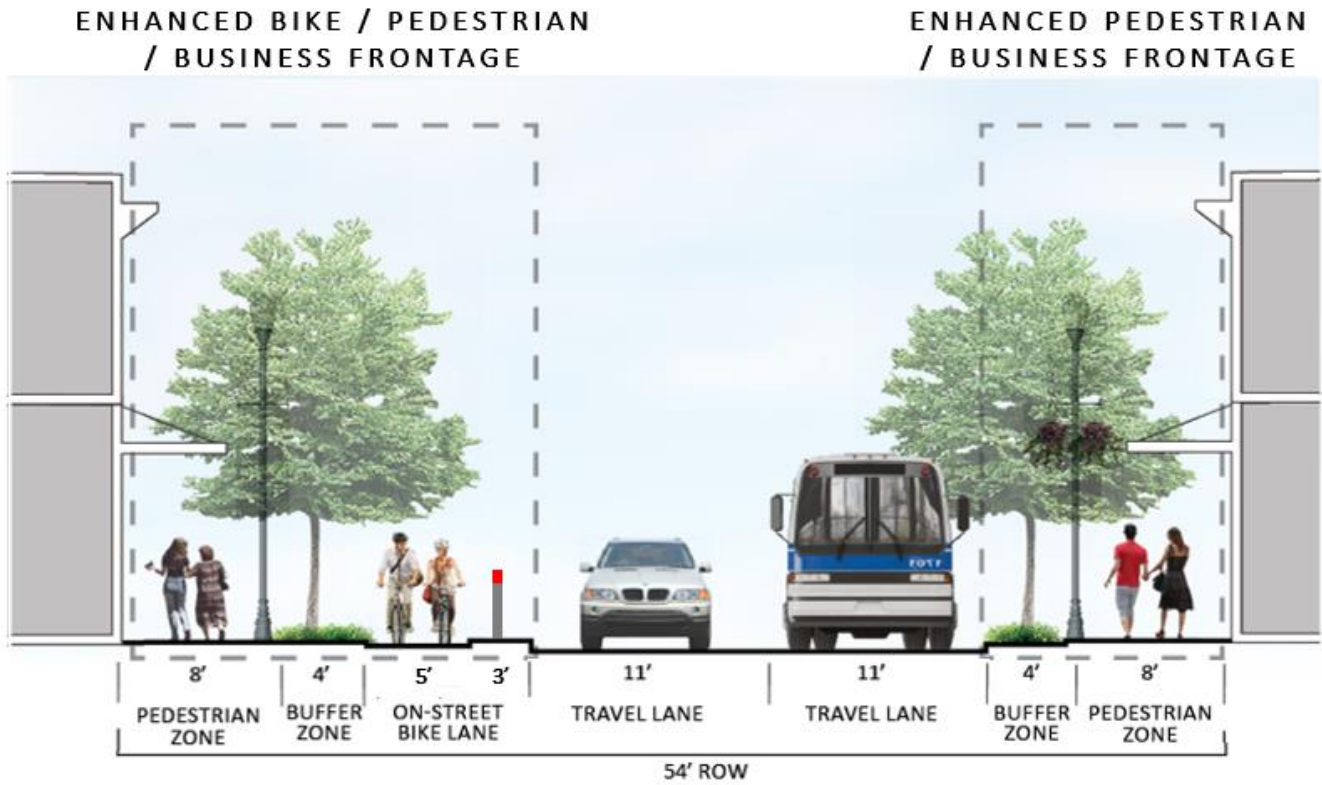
SW 9th Street "Great Street" Northbound Couplet – Cross Section
